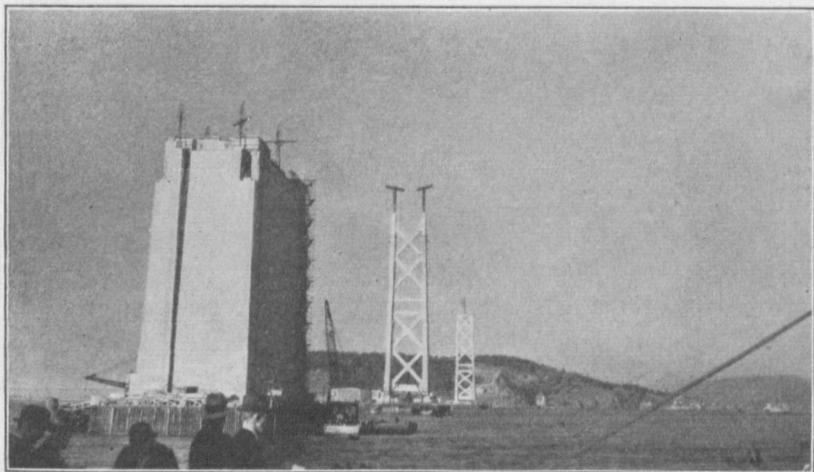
Pier W-4 (and W-5 and W-6 with towers), Oakland Bay Bridge, February 15, 1935.
